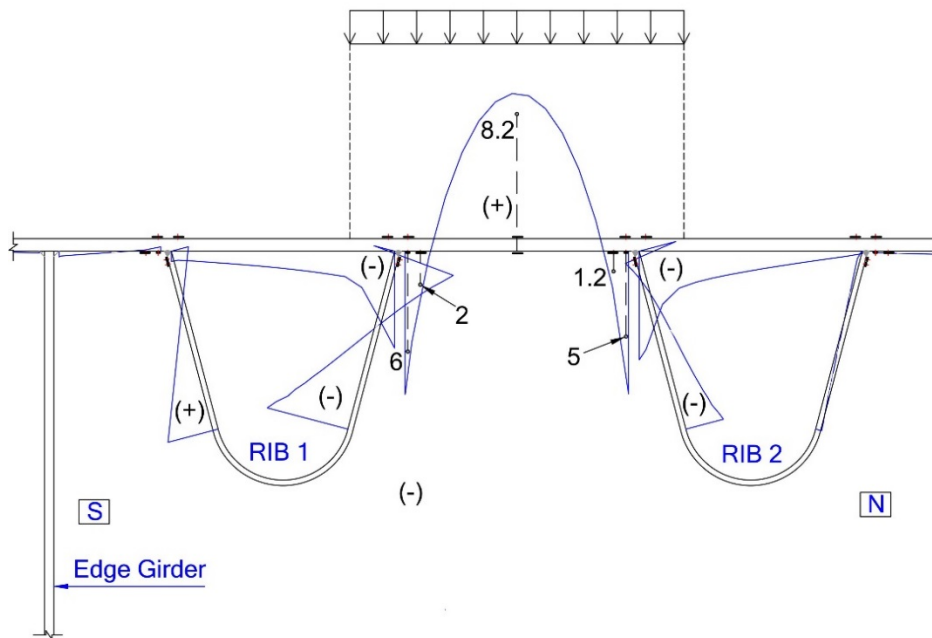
Transverse stresses on bottom of deck and inner face of rib wall from FEA at rib-to-deck plate connection at section Z-Z under south-east load pads with static test results plotted as dots
